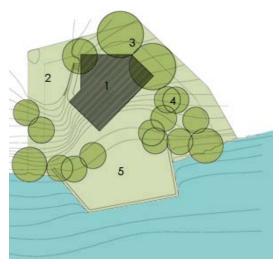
Site Plan - 1. House 2. Parking 3. Garden 4. Garden 5. Front Lawn
